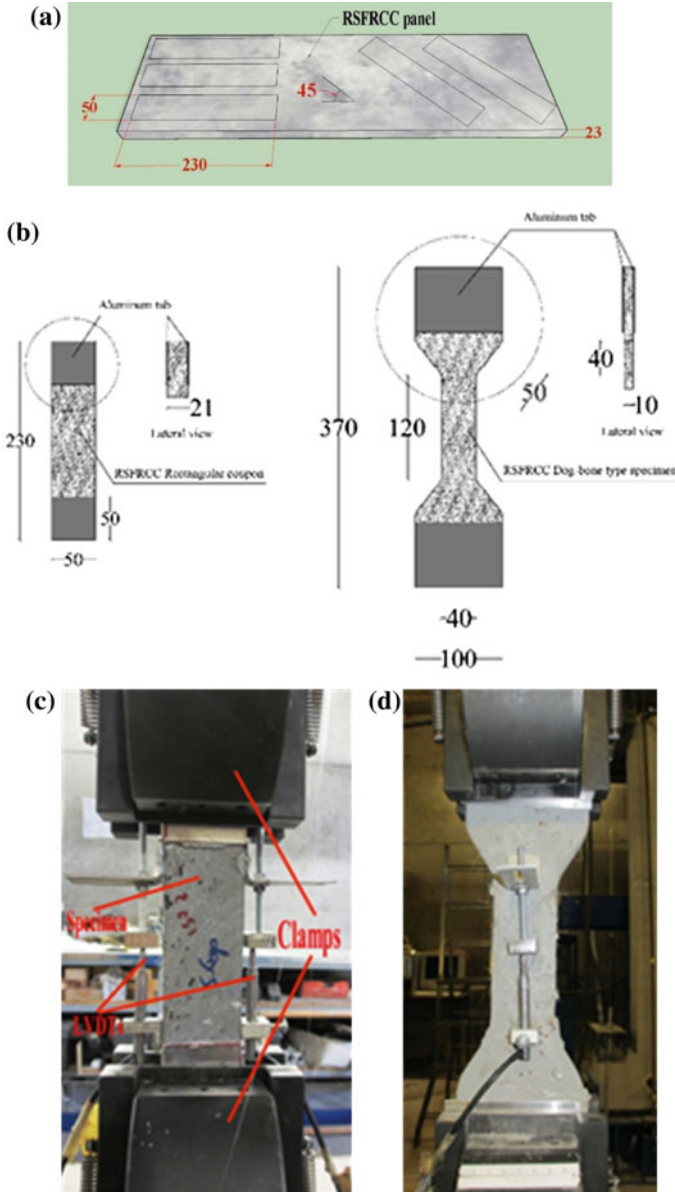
Direct tensile tests with RSFRC: a configuration for the extraction of the rectangular-type specimens from the panel; b geometry of the tensile specimen's type; c test setup of the rectangular-type specimen; d test setup of the dog-bone type specimen (dimensions in mm)
